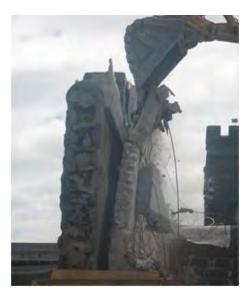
First stages of demolition of the concrete block Women's Prison wall
